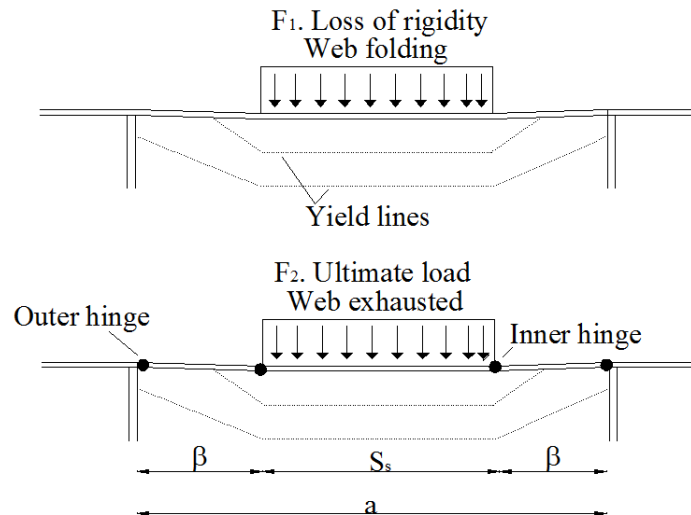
Schematic failure mechanism for girders subjected to patch loading. Case of closely spaced transversal stiffeners.
